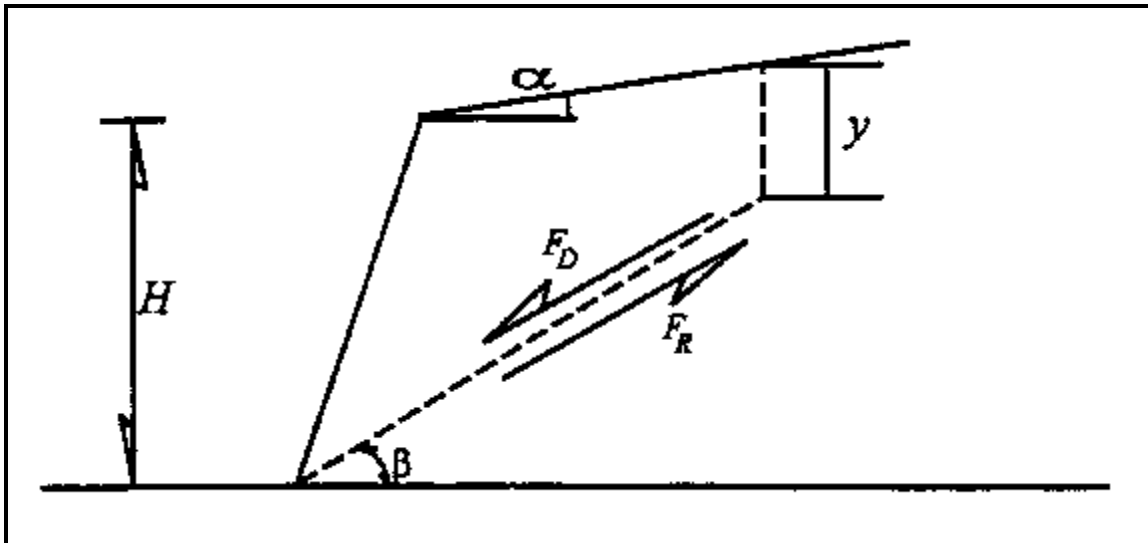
Shear Failure Along a Planar Slip Surface Through the Toe of the Slope With a Tension Crack
